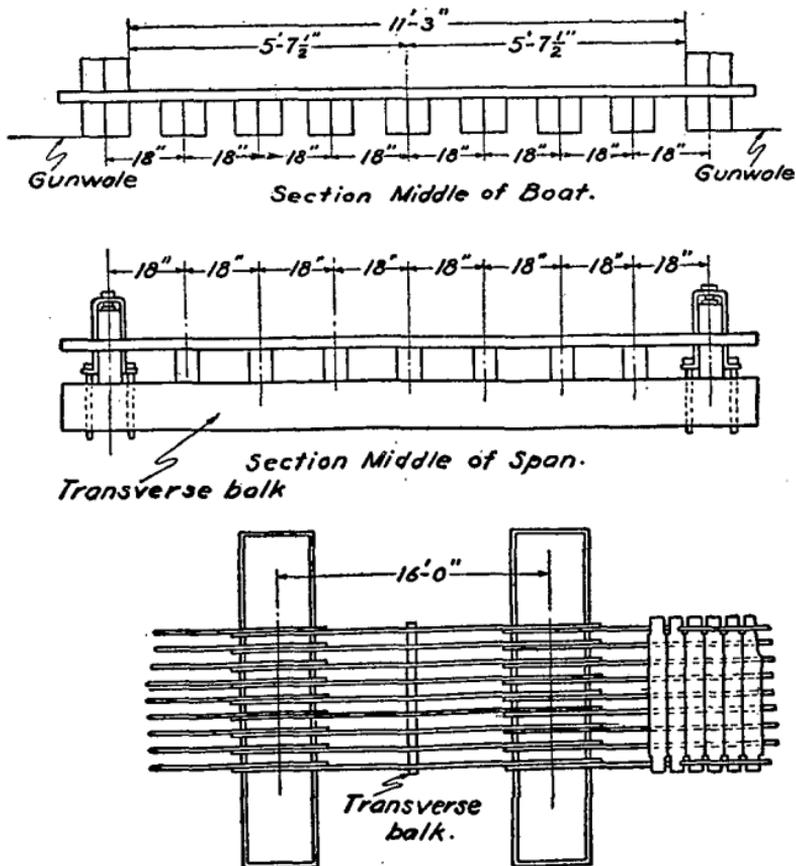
Floor system, heavy bridge equipage, M1924
